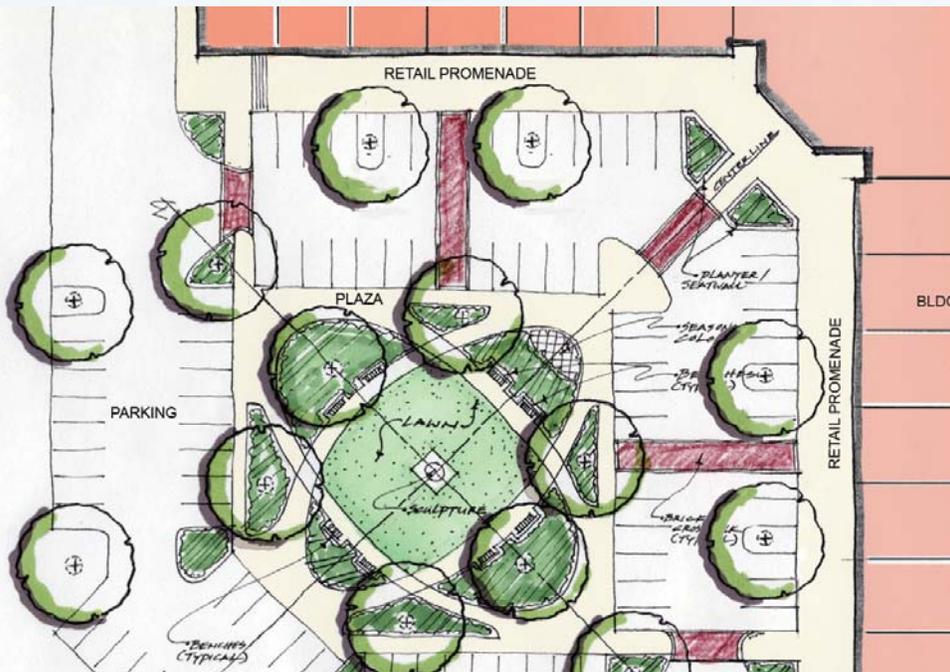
Prototypical plaza design integrates with surrounding retail buildings
